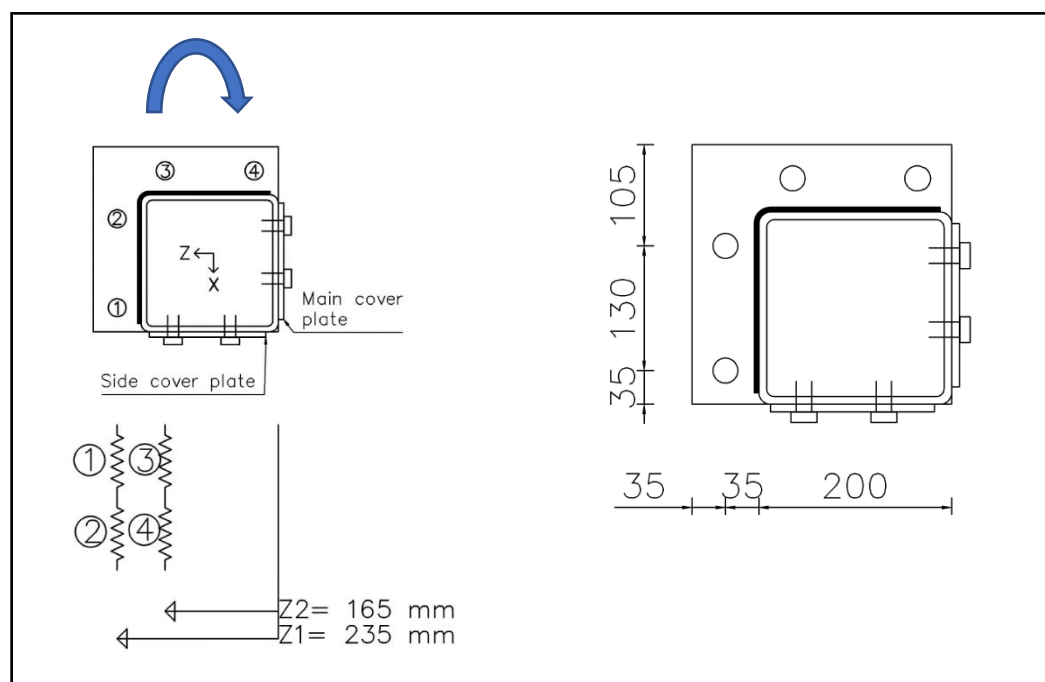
Plan and elevation of specimen CC-1 (case 1)
